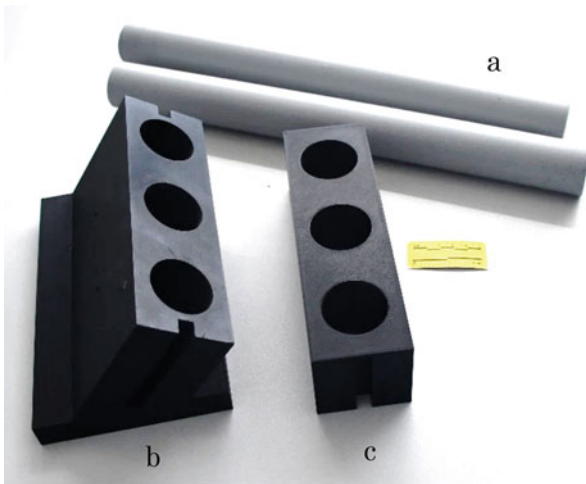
Photo of pile wall elements. (a) piles, (b) foundation beam, (c) head beam
